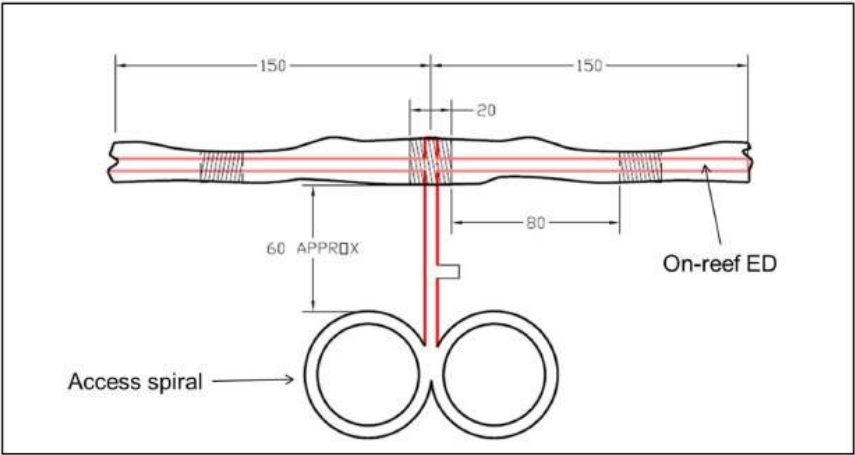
SLOS Longitudinal Sub-level without Footwall Drive
